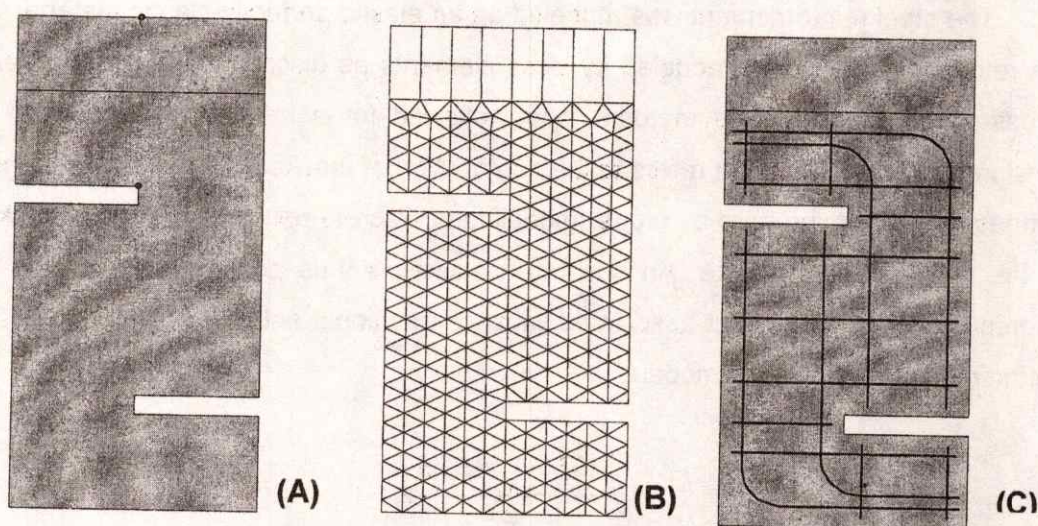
(A) 2D area representing the test specimen, (B) FE mesh, and (C) reinforcement layout.
